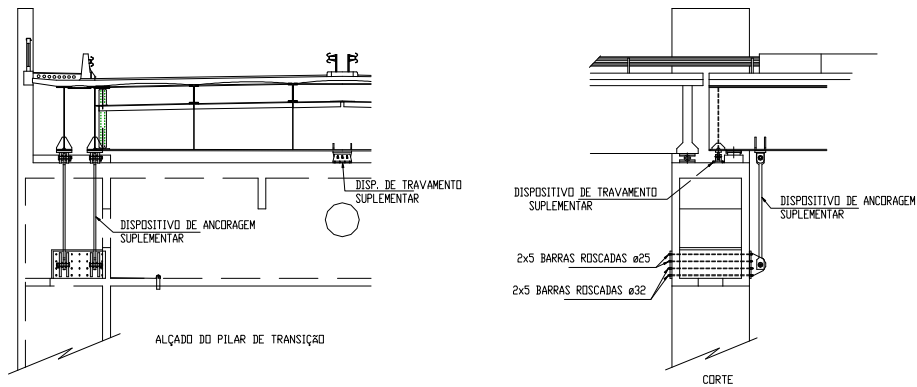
Replacing and strengthening the anchorage system of the deck to the transition piers
